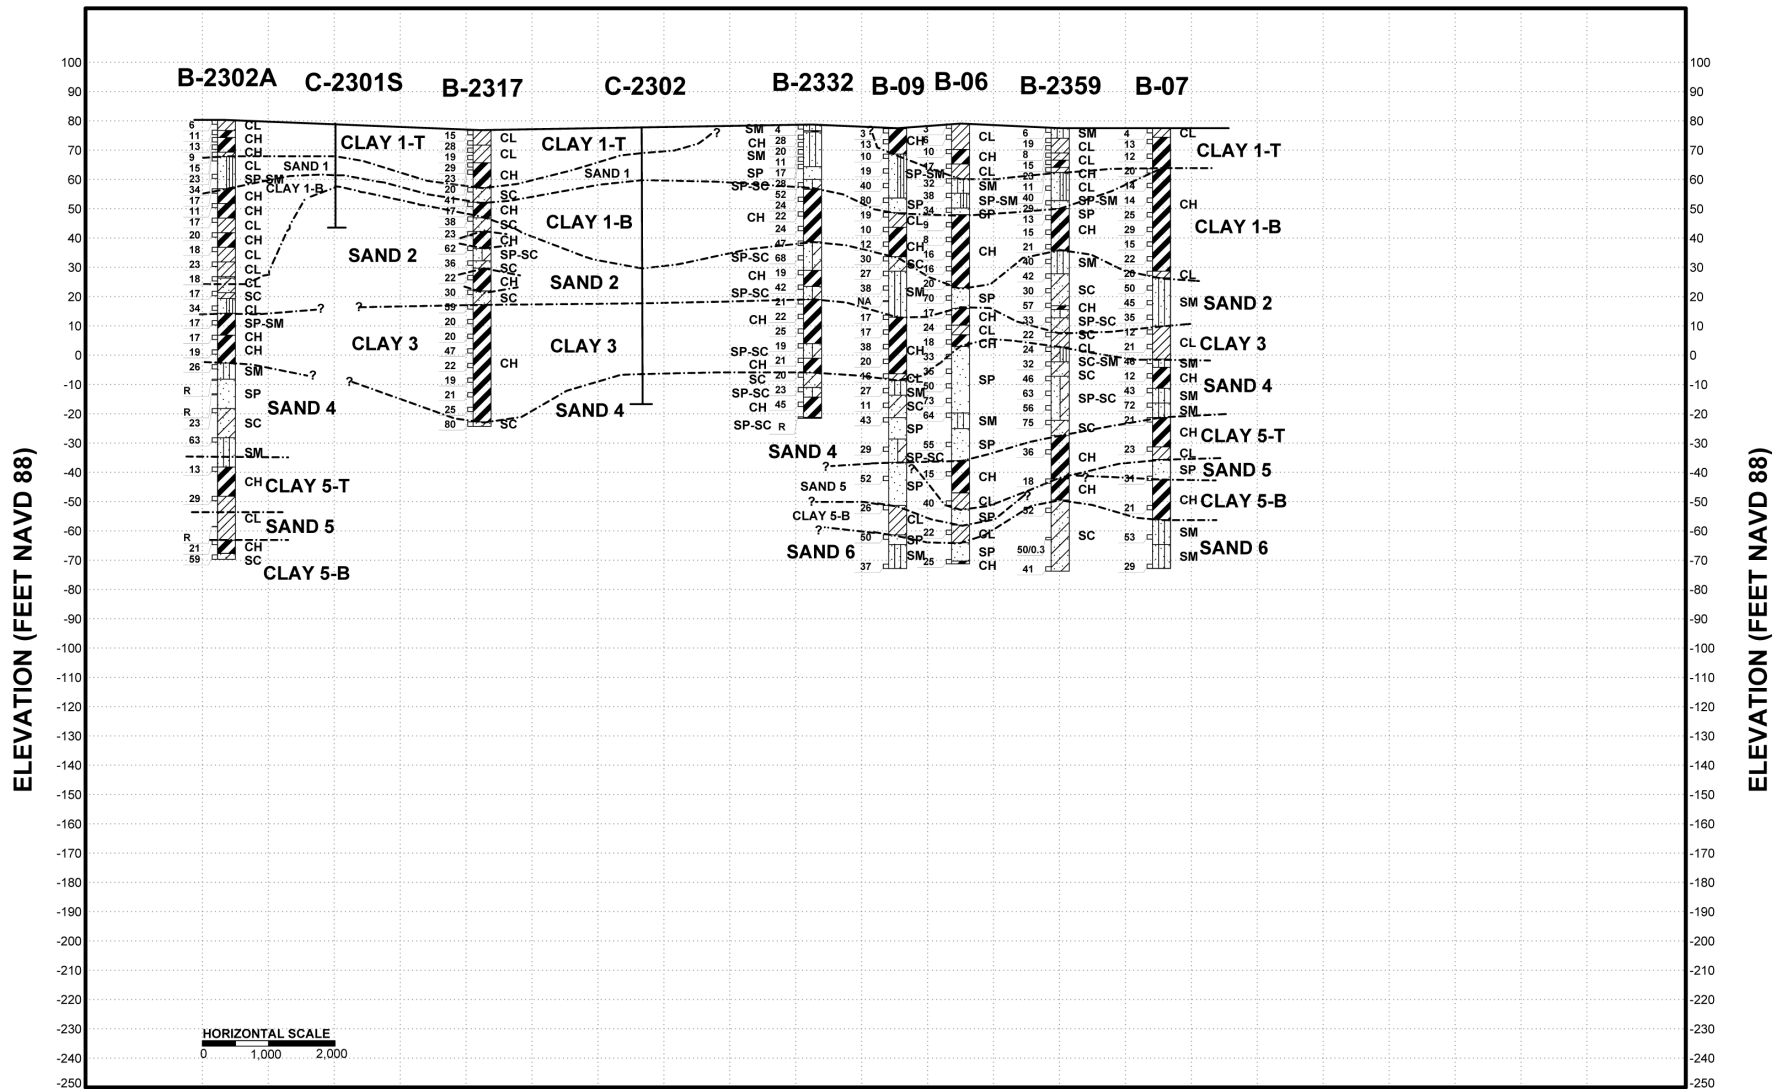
Subsurface Profile H; North Embankment Dam of Cooling Basin/GBRA Storage Water Reservoir (East-West)
